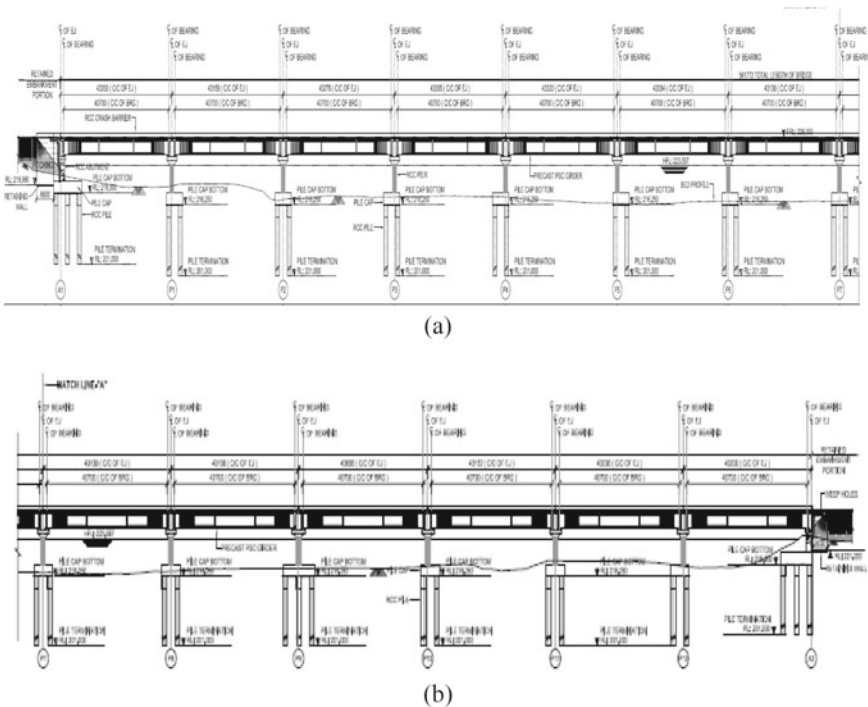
Typical sections of bridge in Punjab, a left and b right sections
